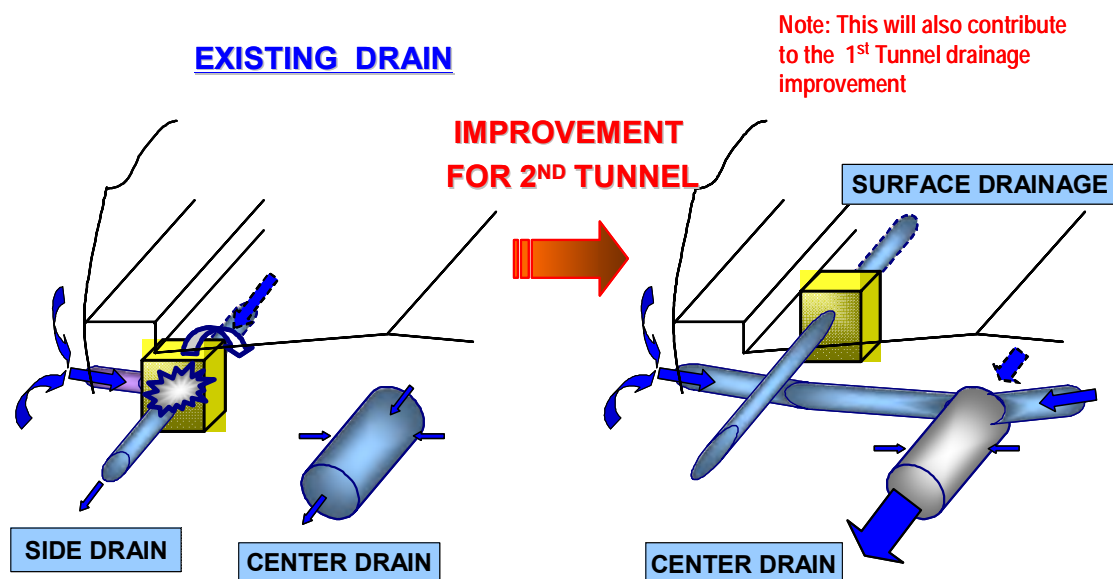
Drainage Plan for 2nd Kohat Tunnel
